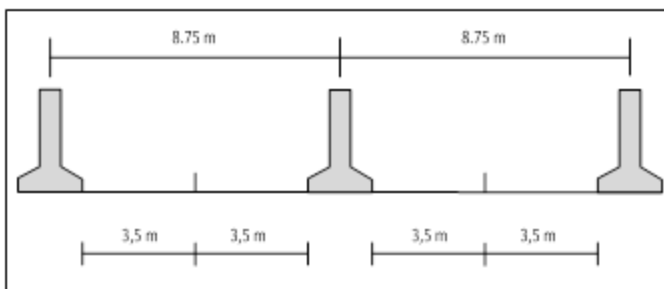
Antasari-Blok M Elevated Freeway Cross Section
